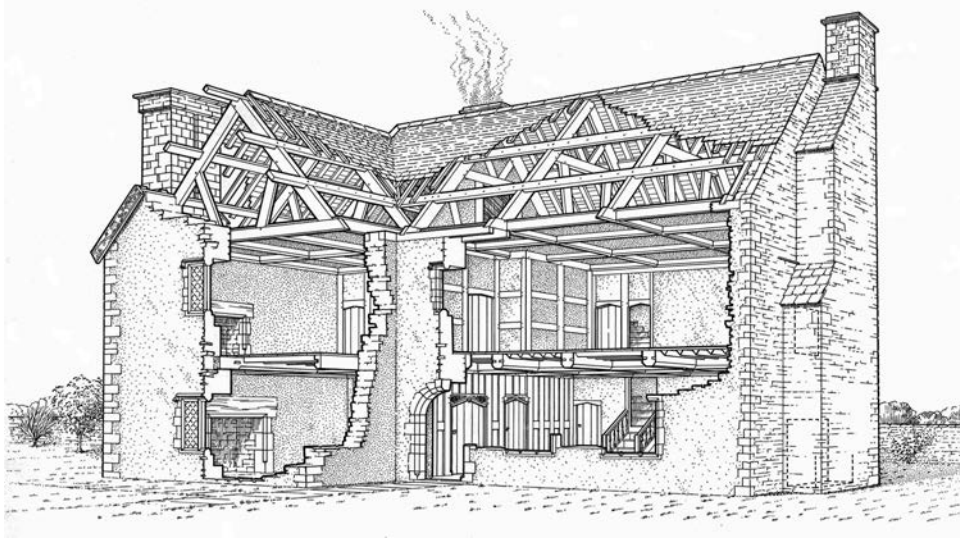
Llanddewi Hall (Llanddewi, Radnorshire): cutaway reconstruction drawing of the storeyed house with parlour cross-wing at the entry.
